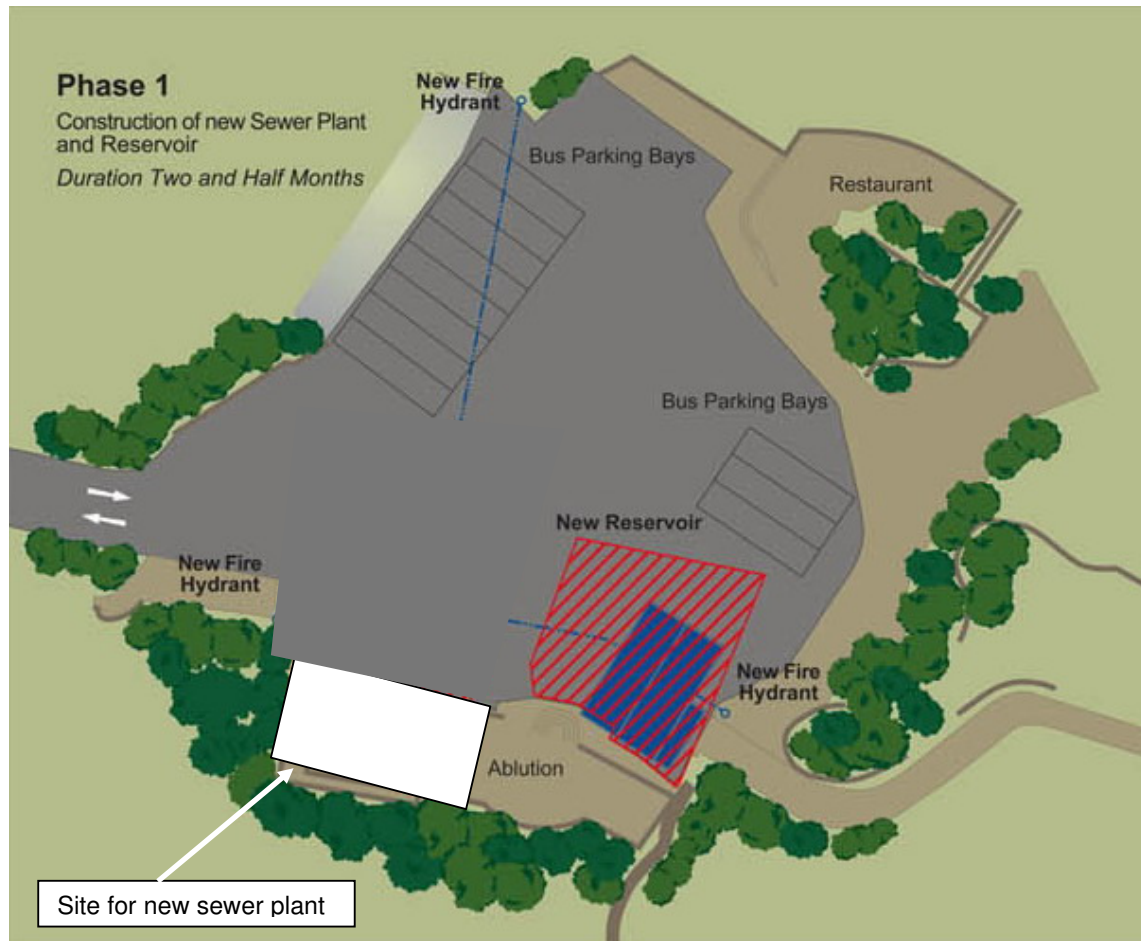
Site Plan showing the location of the proposed sewage plant
